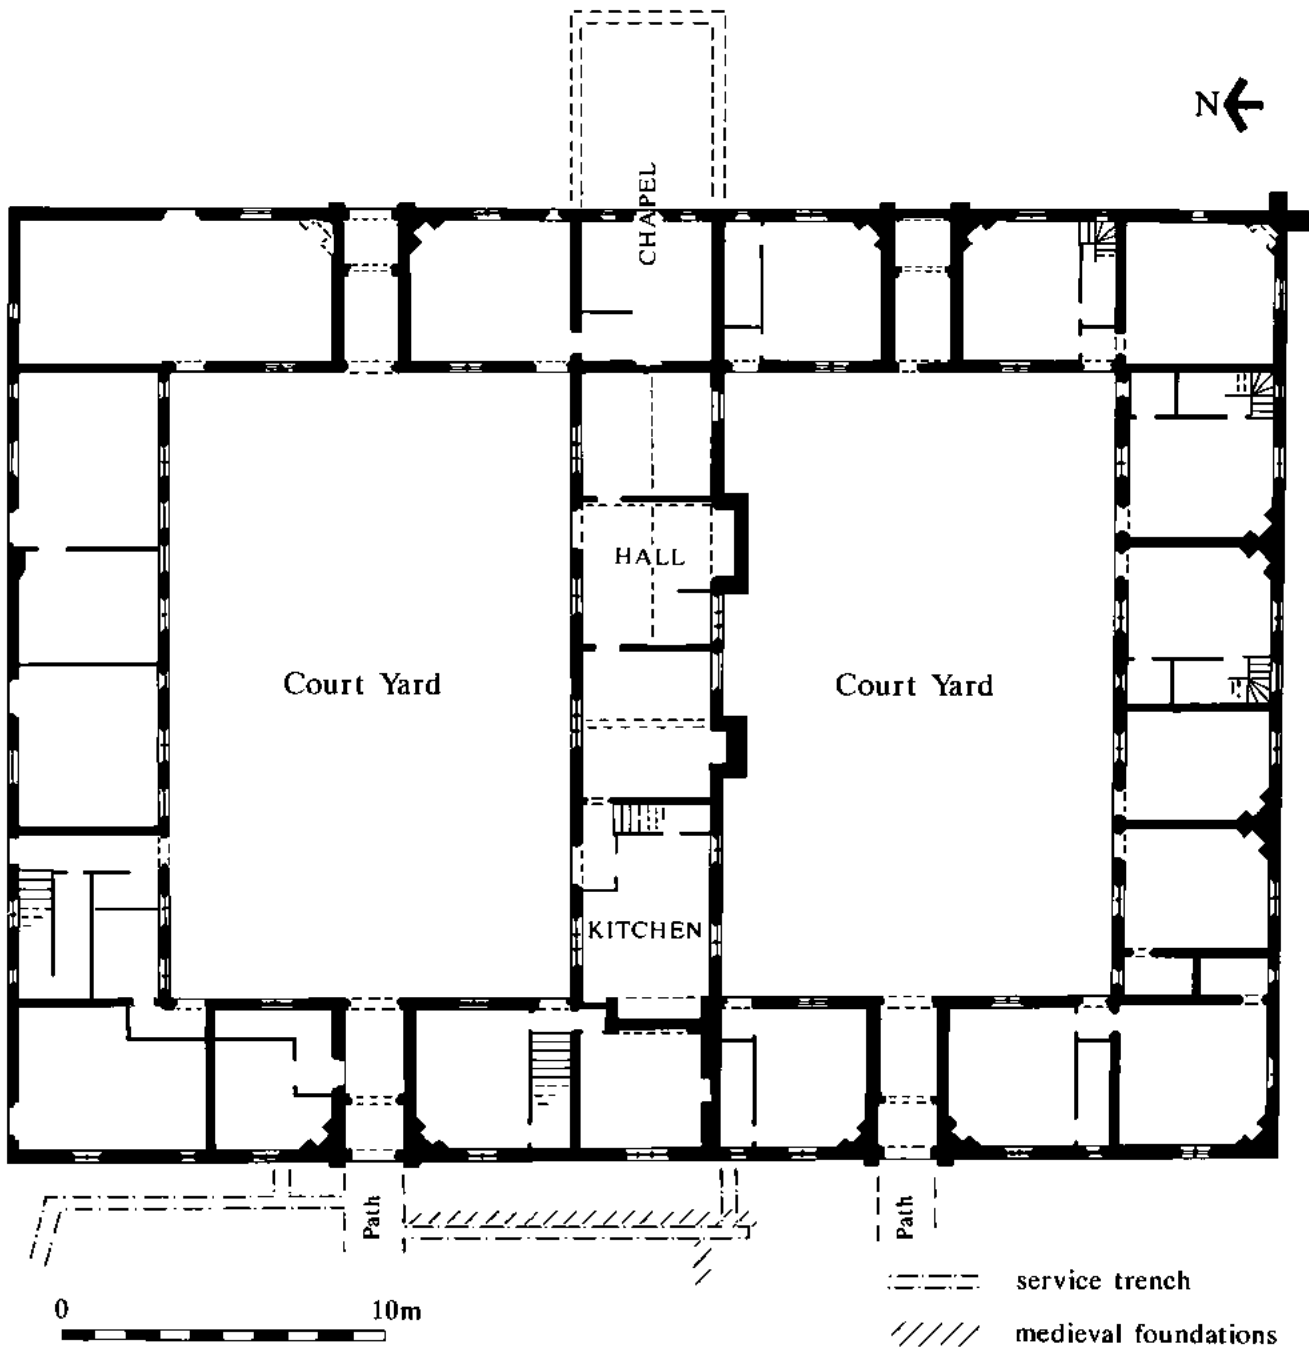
The College of St Mark; plan showing observation of medieval footings.
